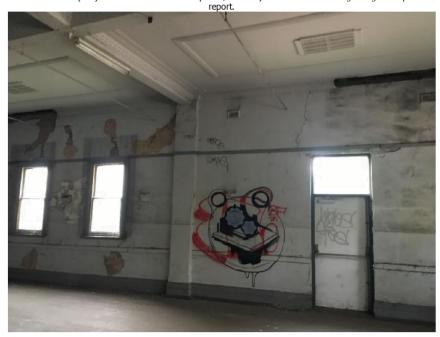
Looking at South Wall internally, cracks have not been repaired internally and run continuously across whole wall. Also brick ties can be seen just below roof level. Patchwork was only done externally, and no work has been done on internal face.
